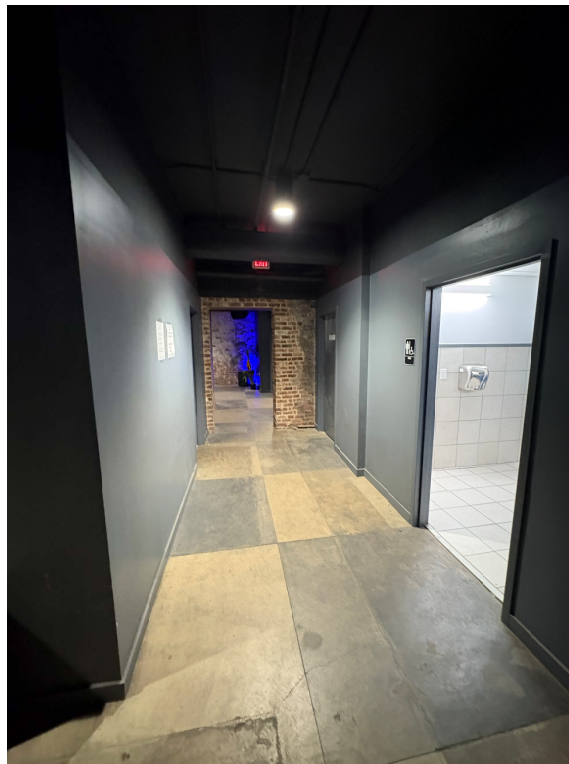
Interior Basement 7 side looking to exit to front at Broad St.
